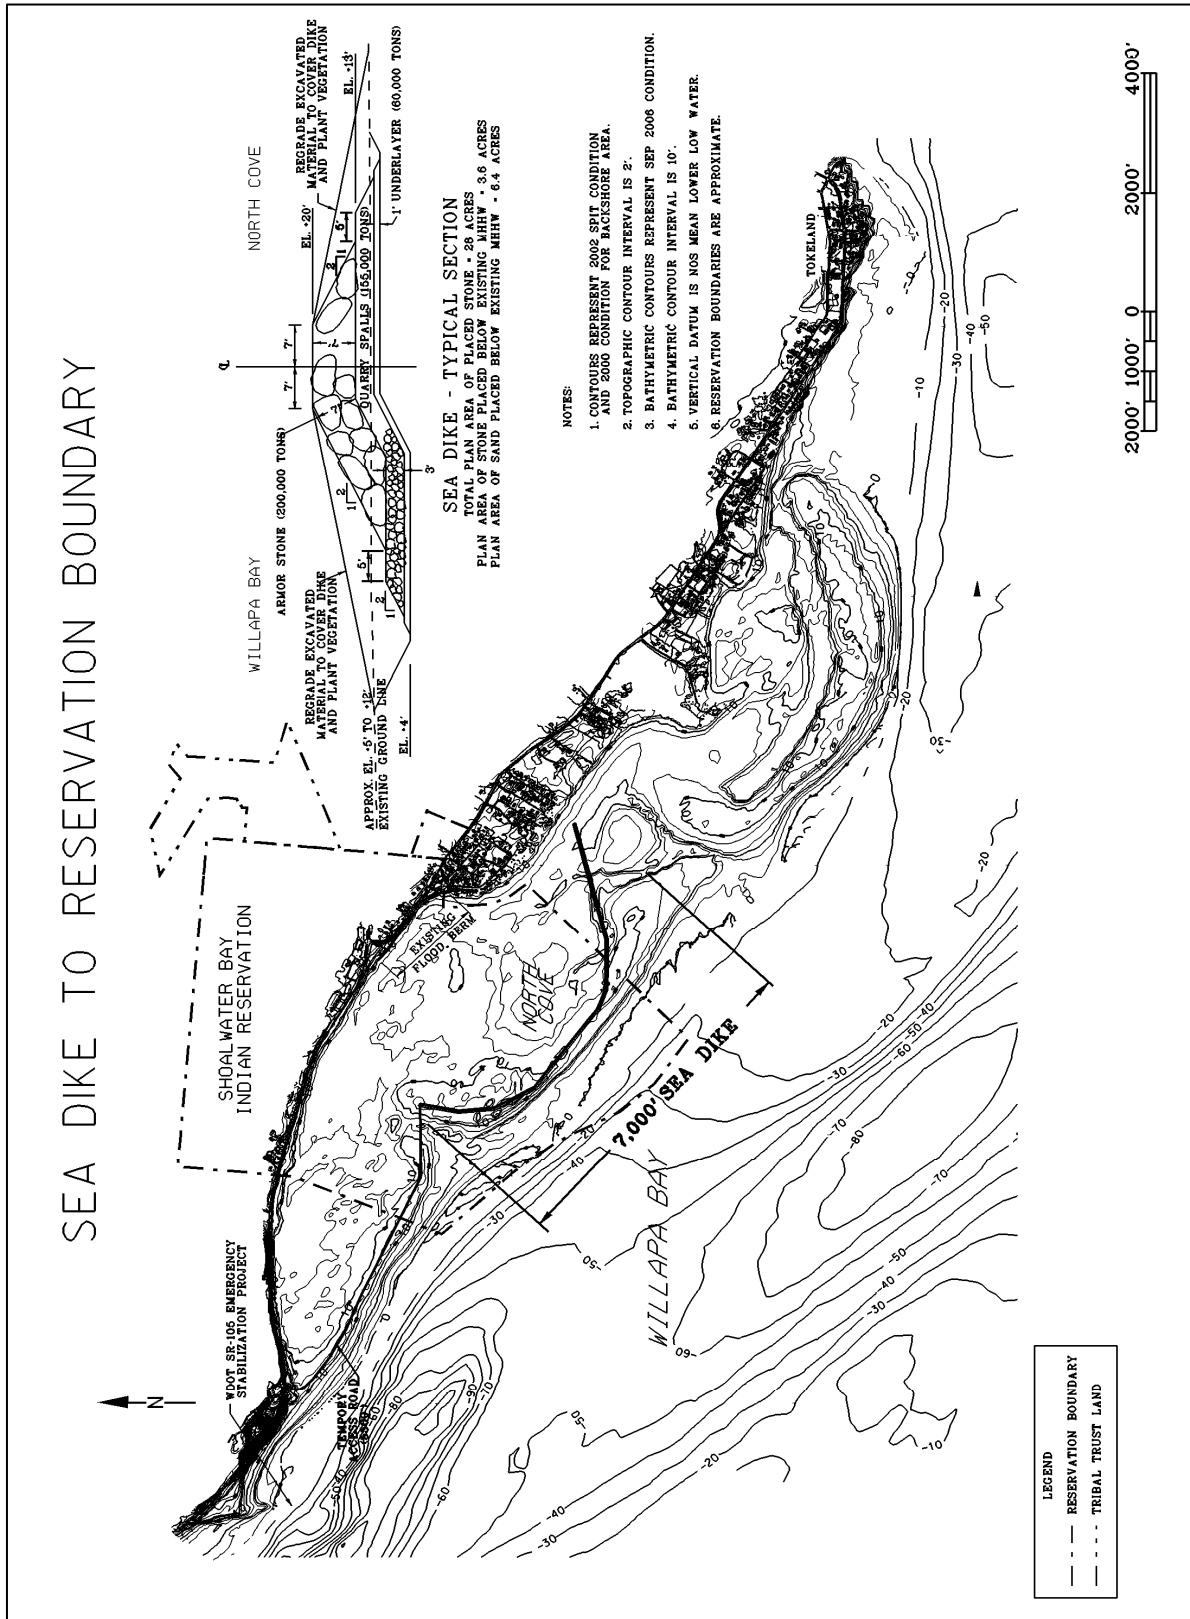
(b) Sea dike to reservation section boundary, plan and section.
